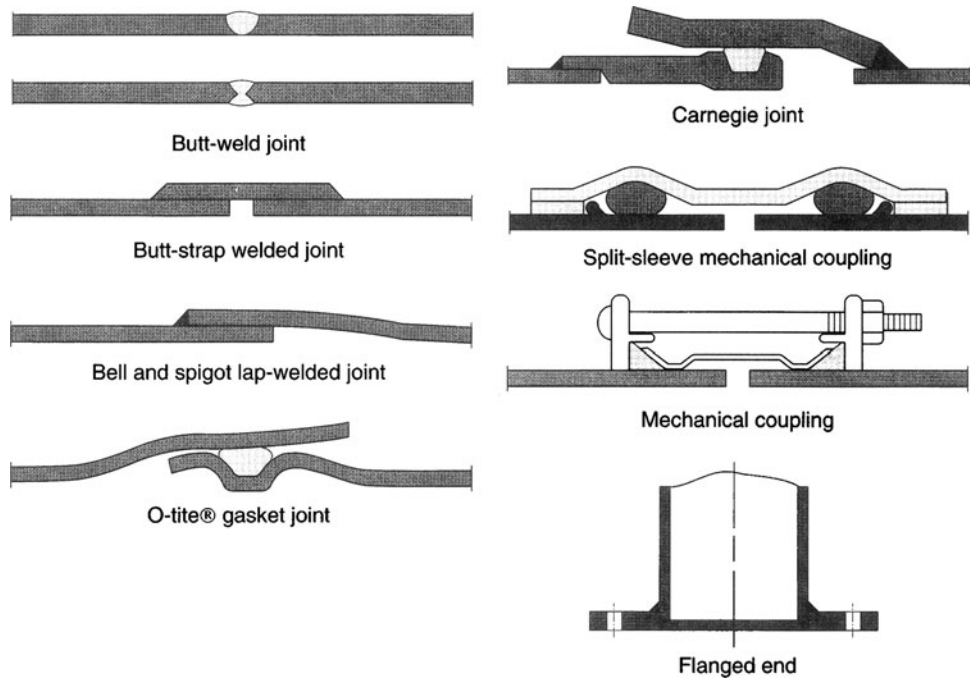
Variety of joints and couplings used for water pipe systems. Gasketed joints can be used for pressures up to 400 psi, and welded joints are recommended for higher pressure applications. Couplings and flanges are used for valve connections or where the diameter changes. (Courtesy of Northwest Pipe Company.)
